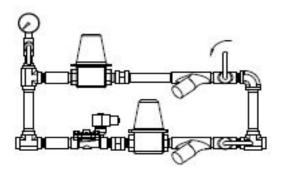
Fire Pump Drive Engine Bypass Valve
